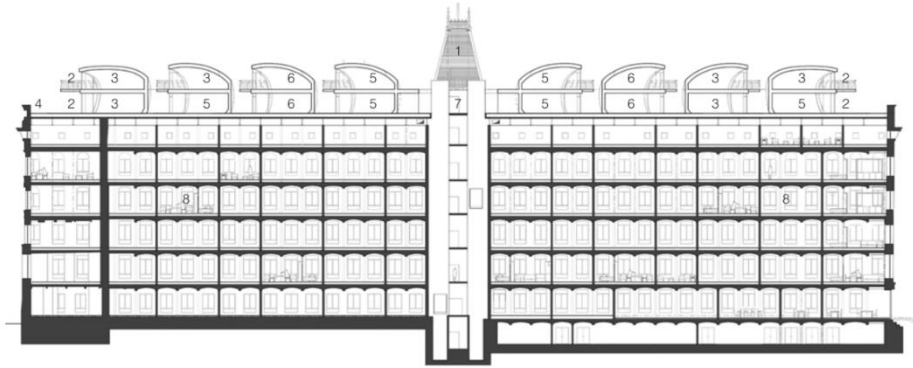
Section drawing of the refurbished Lister Mills building, showing the completed rooftop development. (© David Morley Architects).
